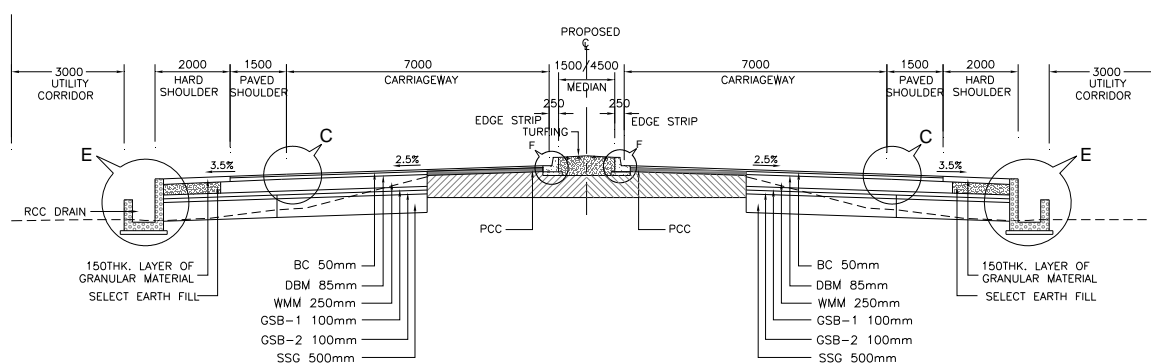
TYPICAL RURAL CROSS SECTION FOR RESTRICTED ROW
